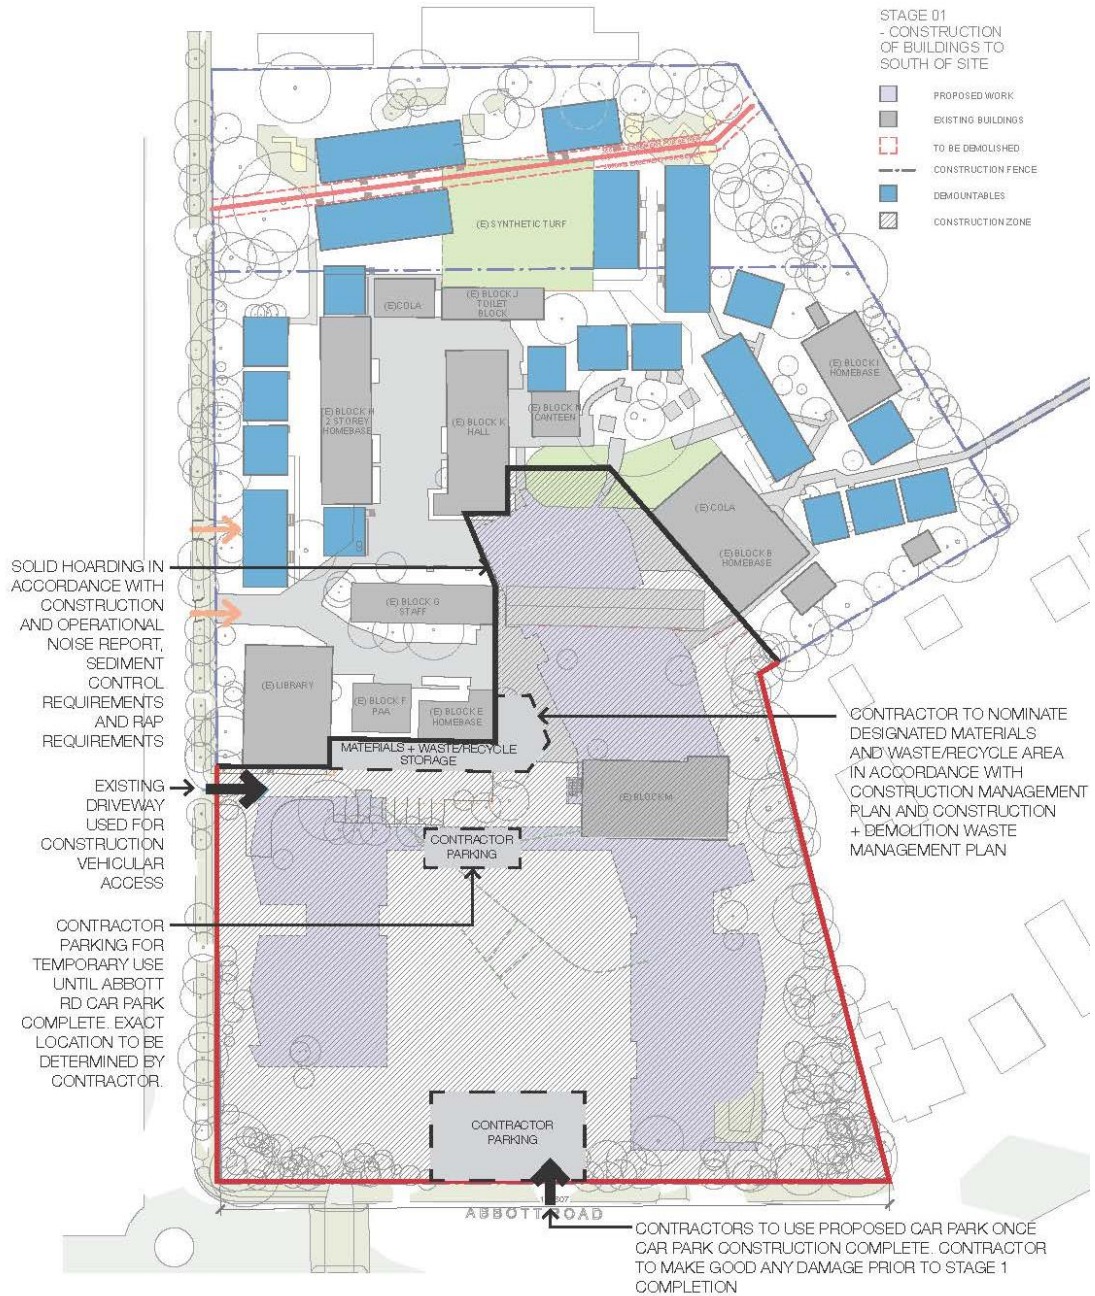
Stage 1 Construction Plan Diagram. CONCEPT ONLY - Contractor to prepare final plan
